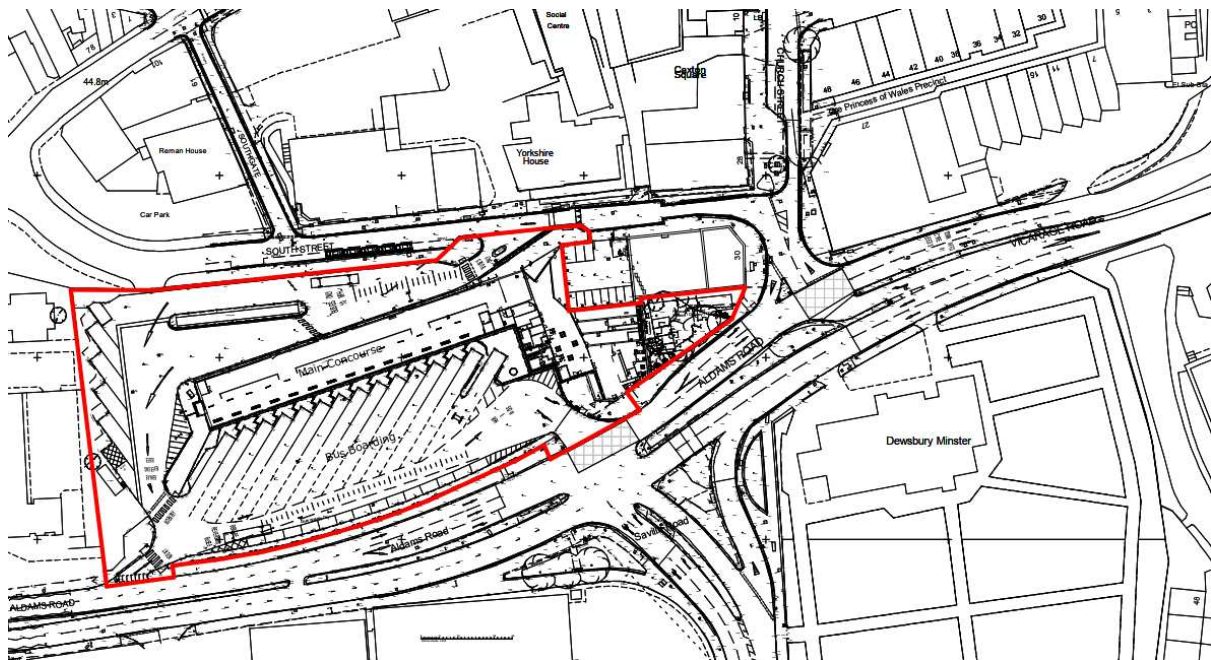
Existing Location Plan Showing Planning Application Red Line Boundary
